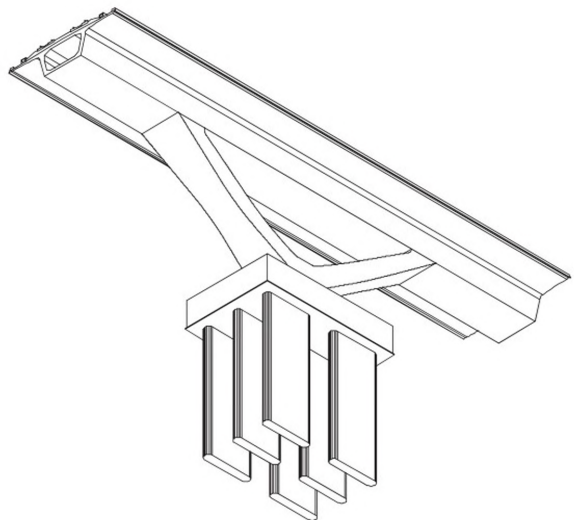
Bridge over the LLobregar River. Deck pier foundation detail.
